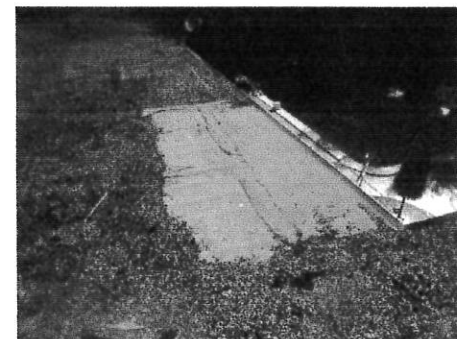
MISSING ROOF GRAVEL(SLURRY)
